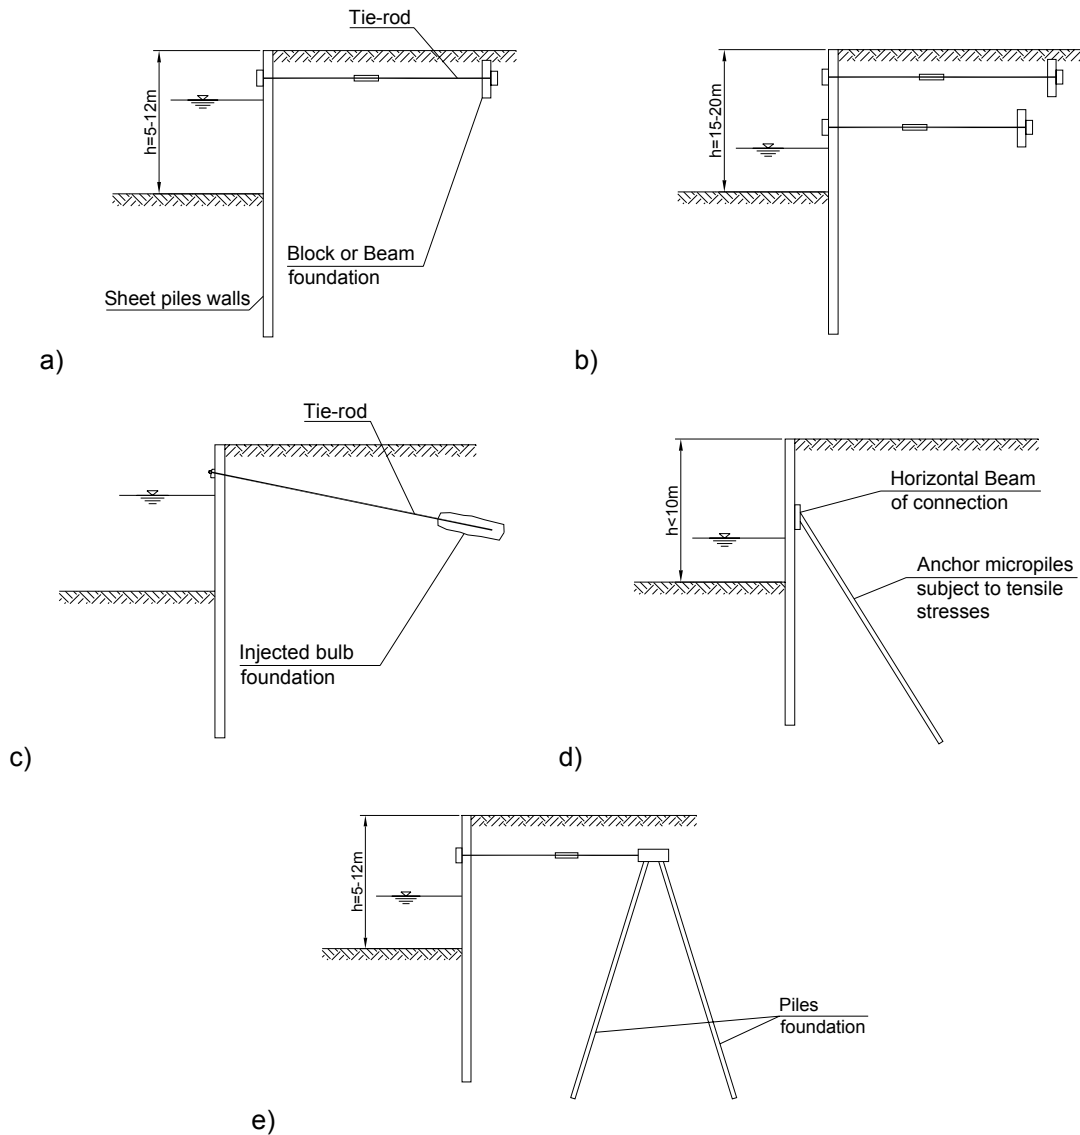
Examples of anchored sheet walls: a) quay wall with a single level of anchors; b) sheet walls with multiple anchors levels; c) injected bulb anchor; d) raking anchor; e) anchor with stand piles.
